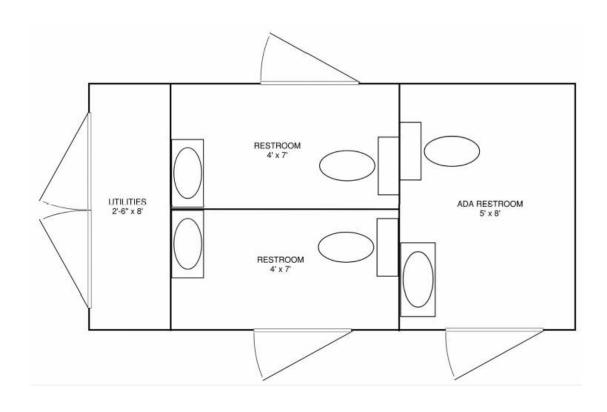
Restroom Facility Floor Layout A: Three Restroom Arrangement
